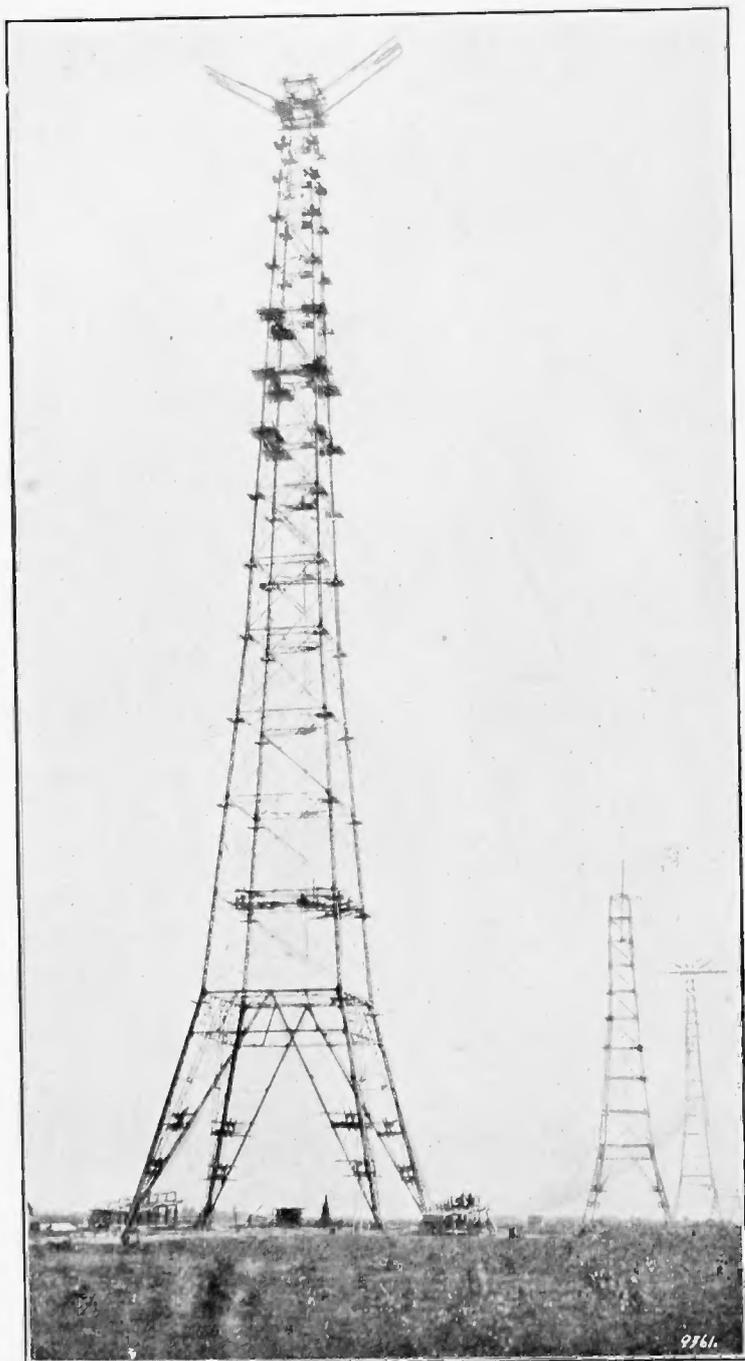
Three of the Towers in Construction Showing Cranes for Hoisting 75-foot Cross-arm Sections
